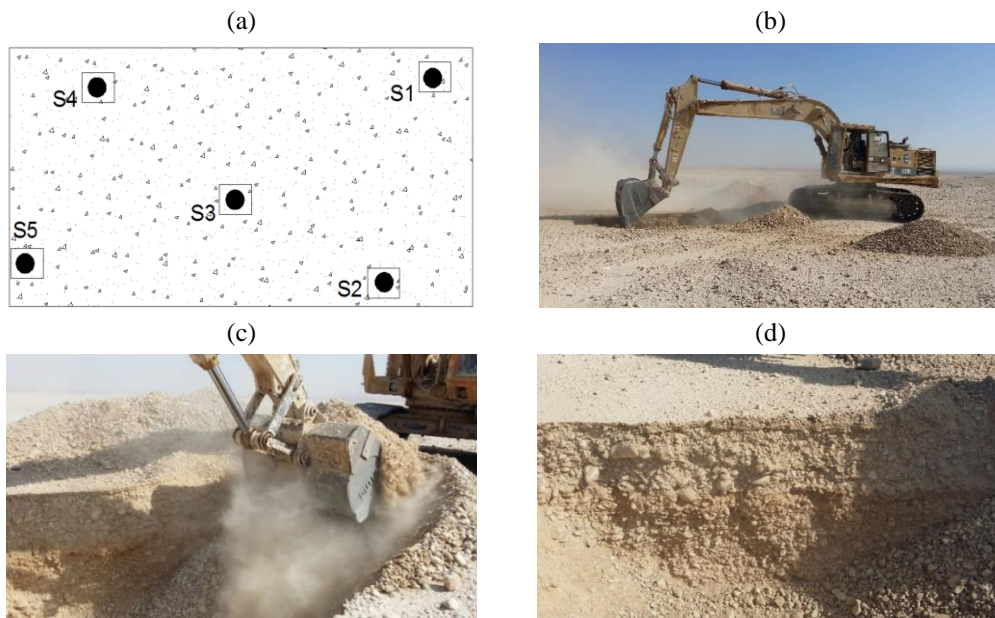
Trenches from which were procured for Abo-Teshet 2: (a) wall side section 1; (b) wall side section 2; (c) wall side section 3; (d) sample location with depth
